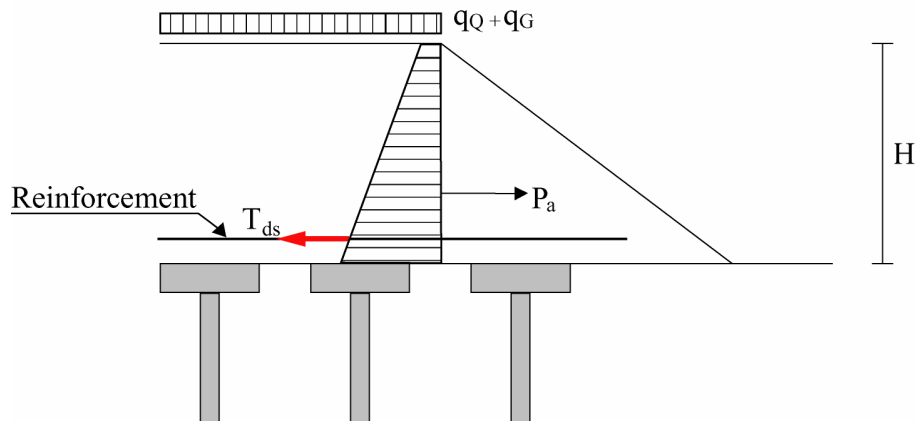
Horizontal force in reinforcement using vertical piles beneath embankment slope.
